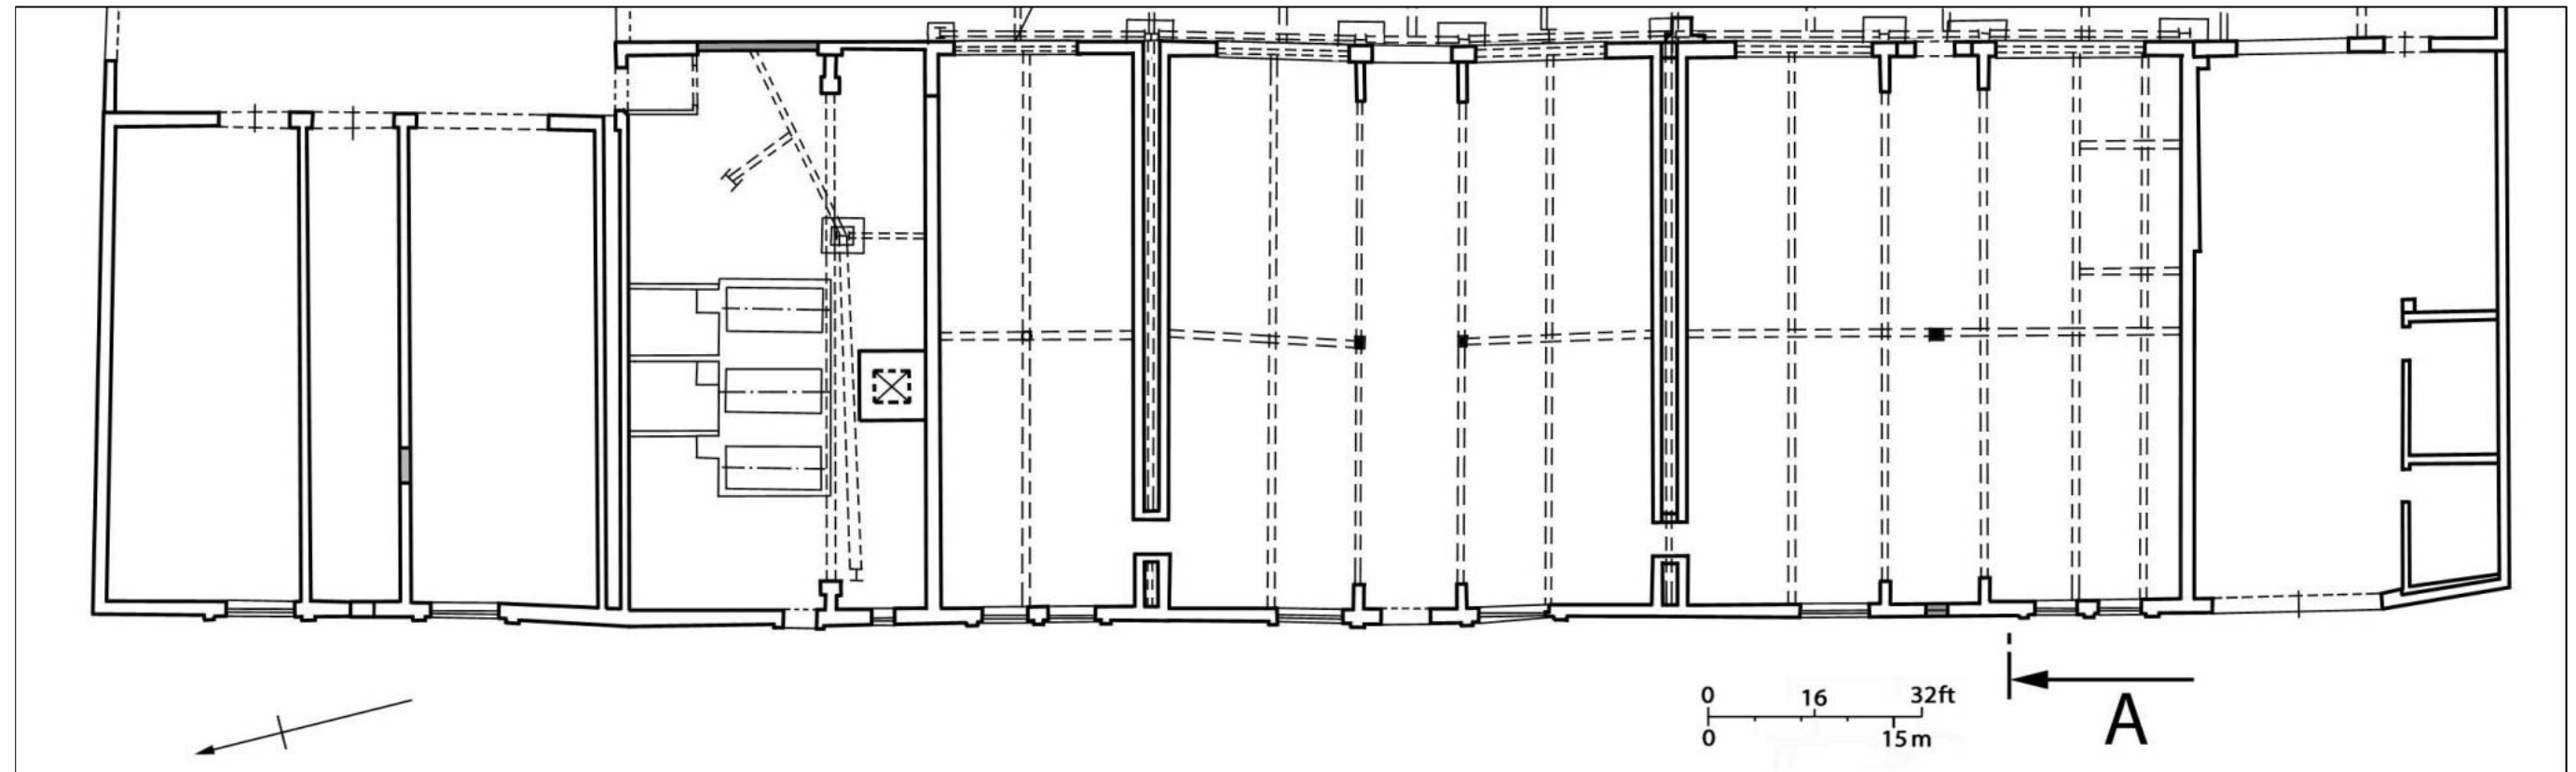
Buildings 'GF3 & GF4' second floor plan.
